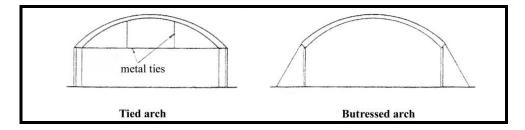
Two hinged arches are constructed in two ways (Hornbostel and Hornung, 1982:182).
